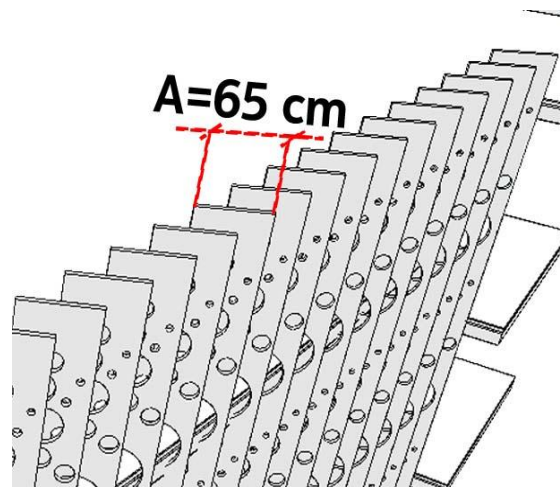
hidasse building envelope (Source: Site Observation Author 2024)
